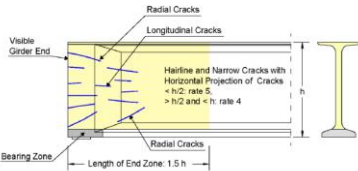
Horizontal or radial end zone cracks in NU girder webs with exposed ends and end blocks
